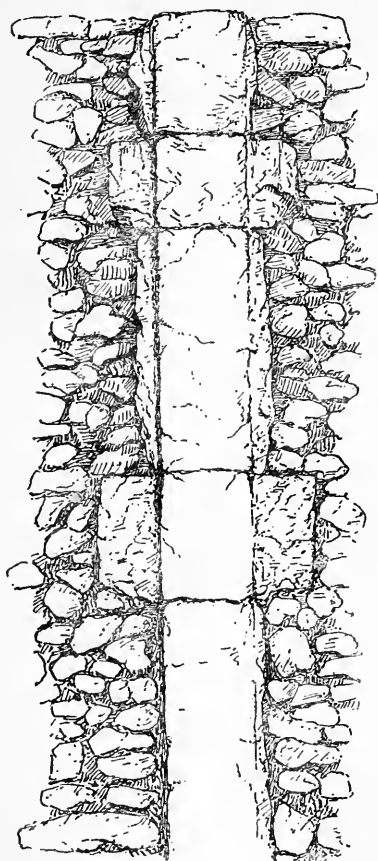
Pilaster strip, Breamore, Hants. The strips are about 11 in. wide.
